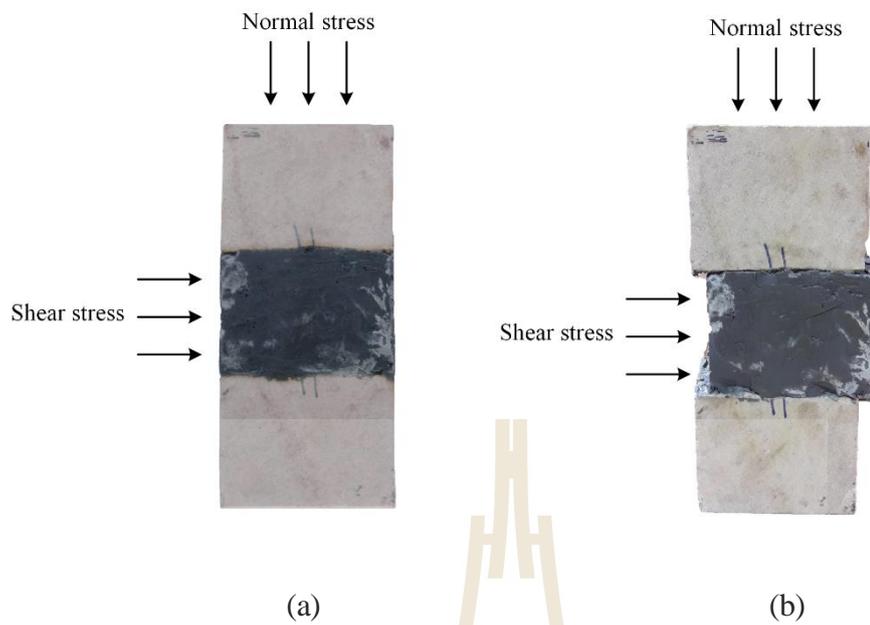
Some specimen of grouting material in sandstone rock fracture before (a) and after (b) failure under shearing.
